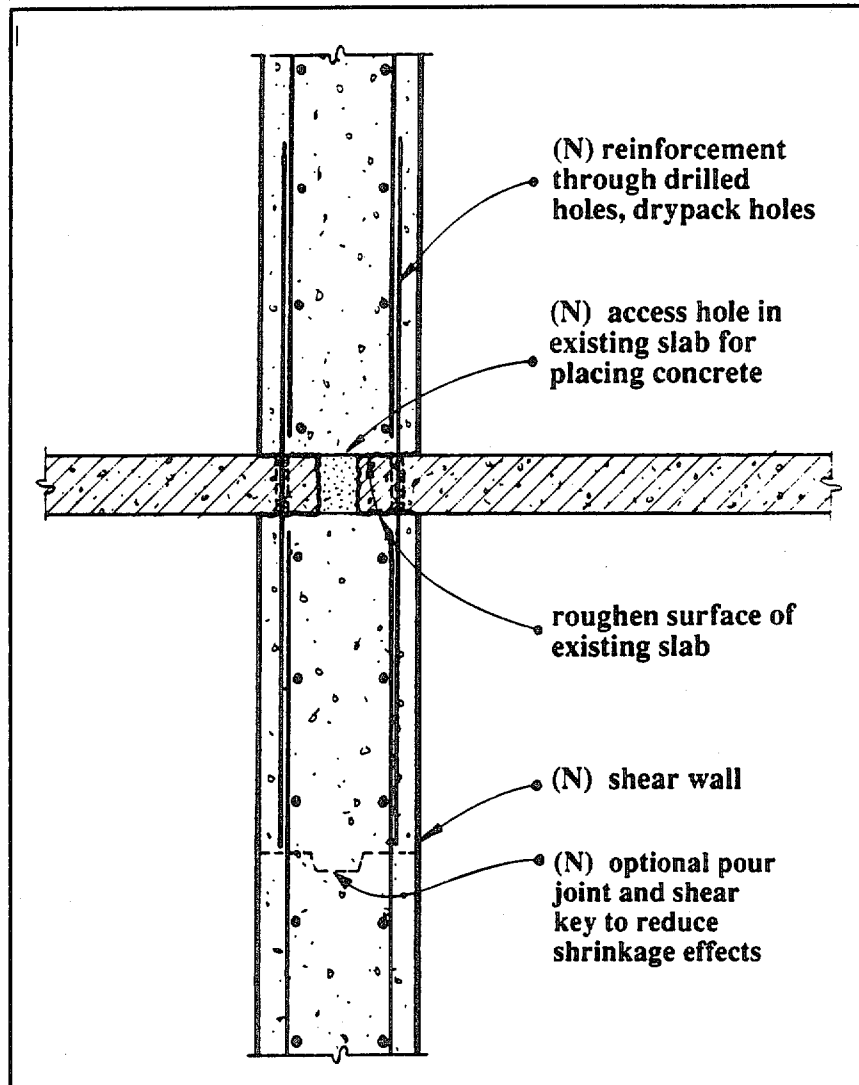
Connection of a supplemental interior shear wall.
